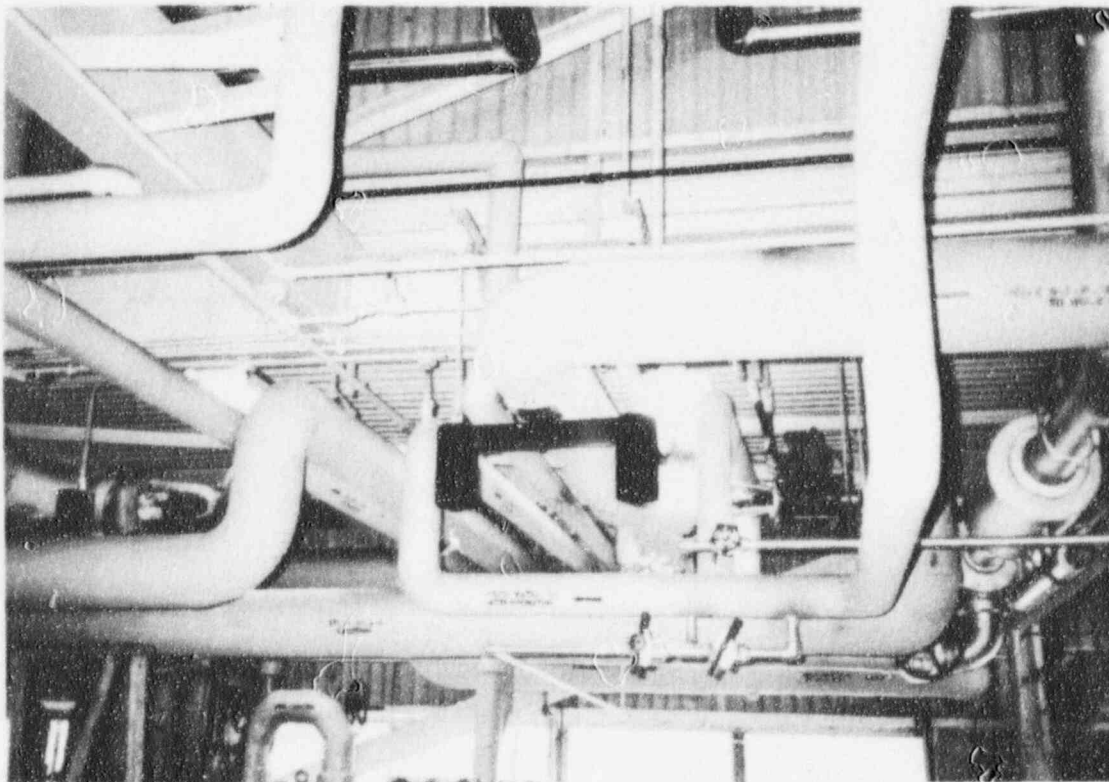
Spring Trapeze Support Large Bore Hot Line in Humboldt Bay Unit 2
